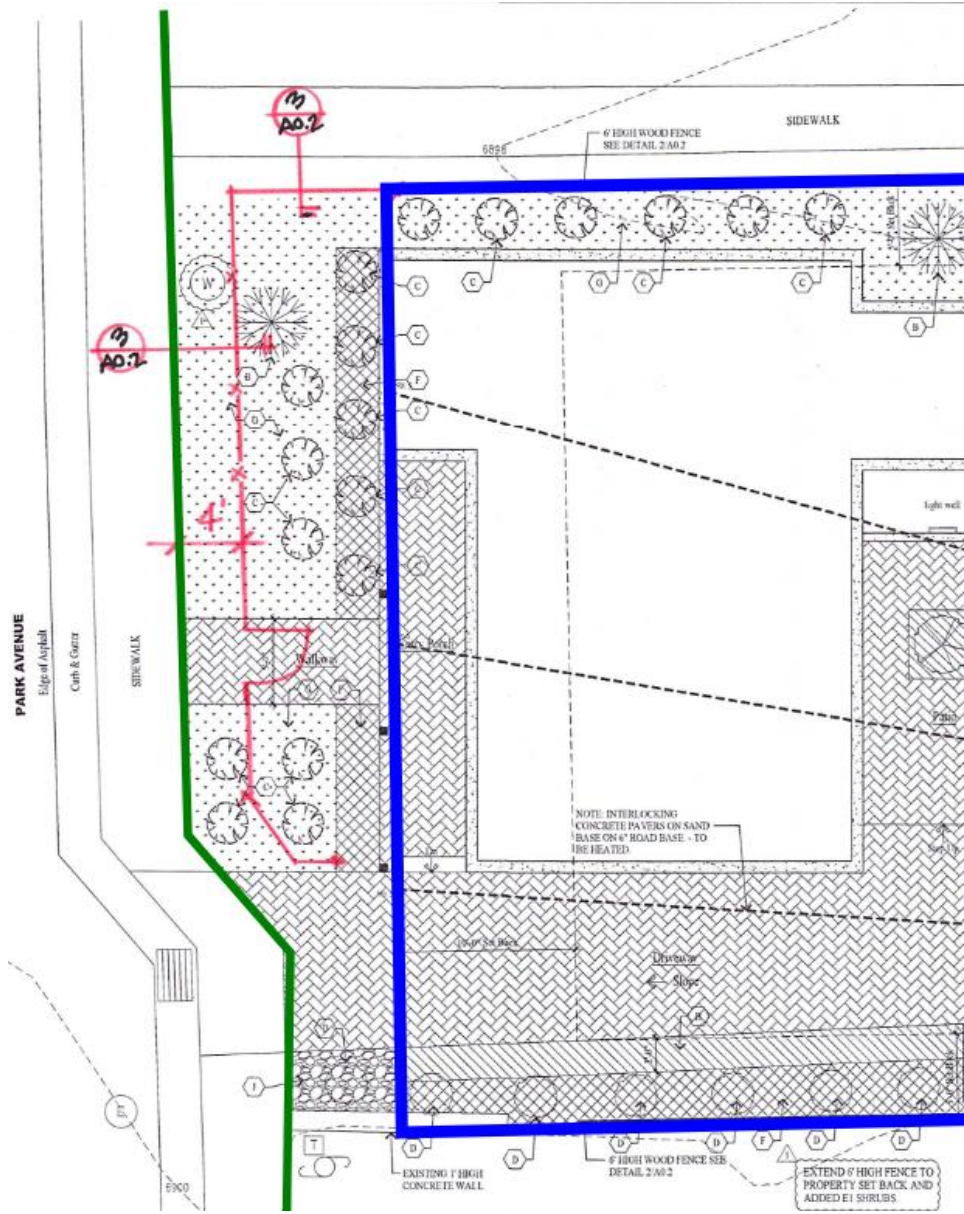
1304 Park Avenue, the proposed fence is shown in red and is drawn by the Applicant. Staff has highlighted the property line in blue and the back of the sidewalk in green.
